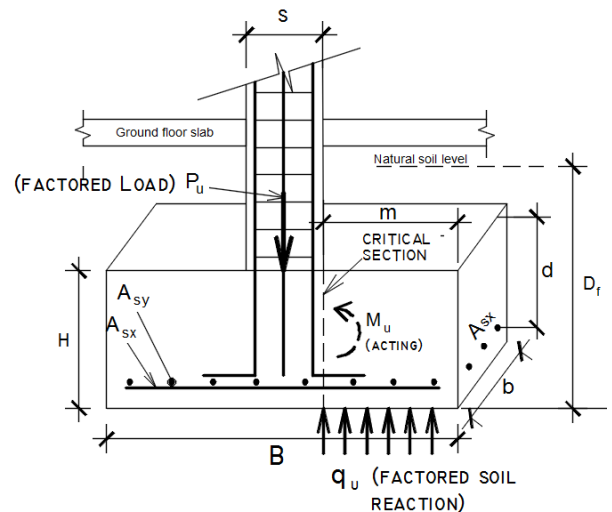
Acting flexural moment in footing and elements for determining steel area.
